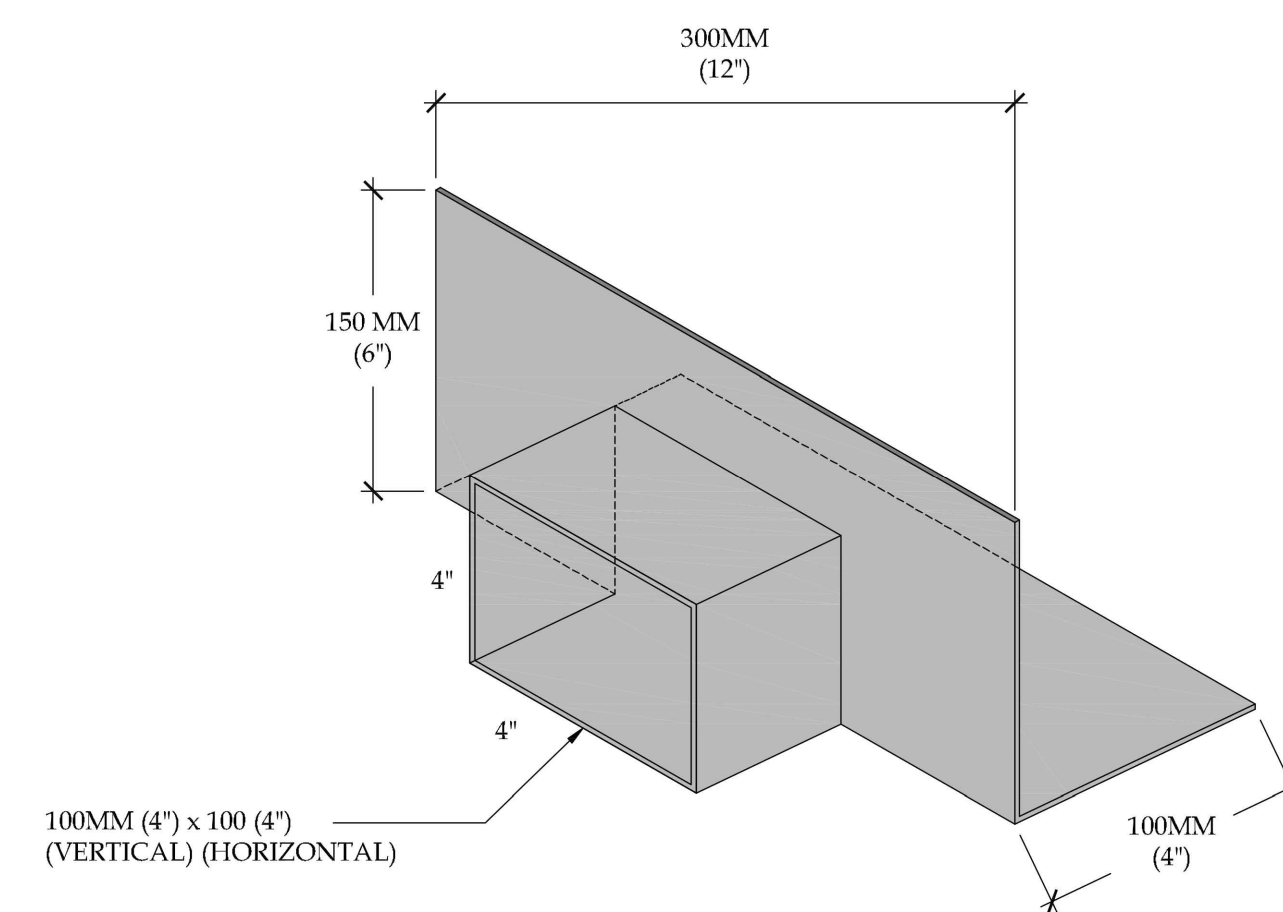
DETAIL-ENCLOSED DECK DRAINAGE CRICKET
